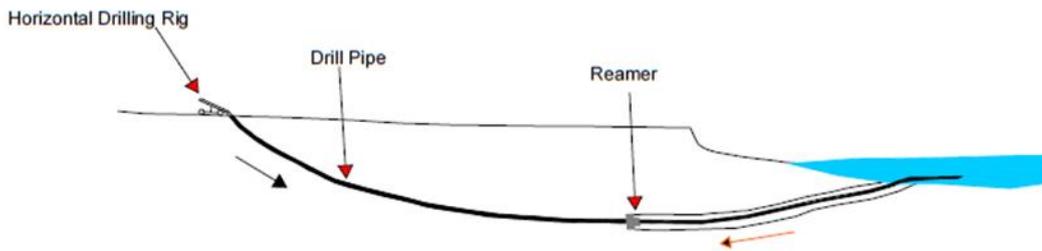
Typical HDD Installation at a Typical Landfall | not to scale
